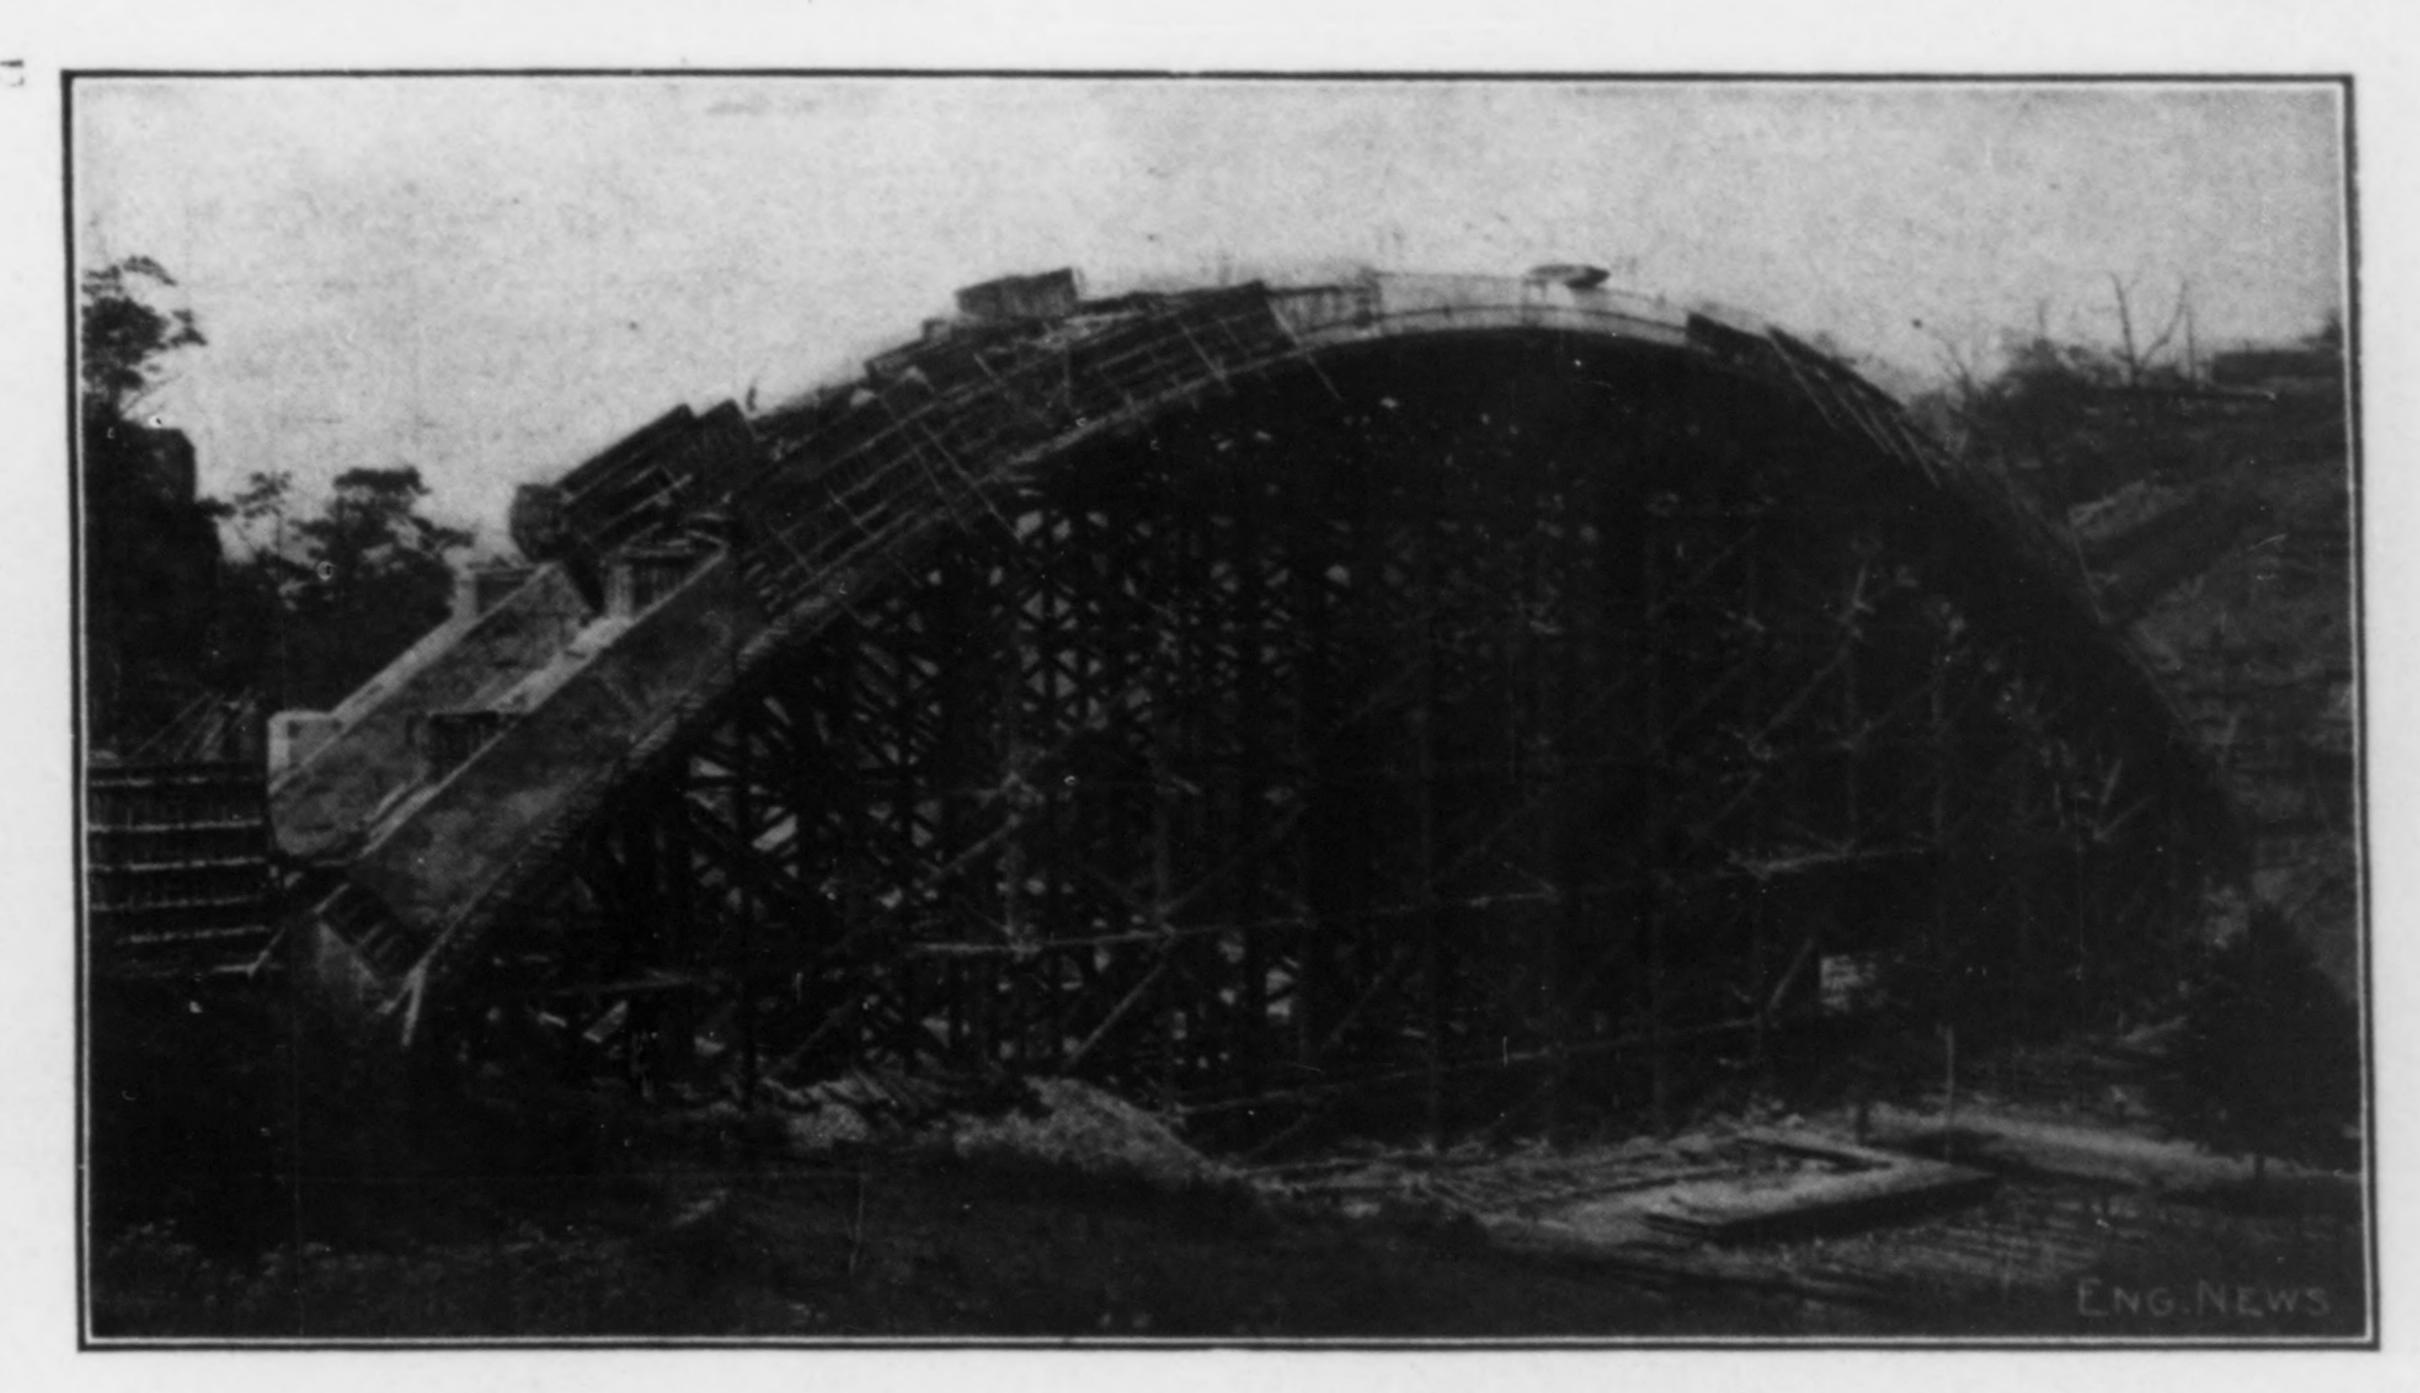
CONCRETING RIB SECTIONS OF THE LARIMER AVE. ARCH (SEPT. 6, 1911)
